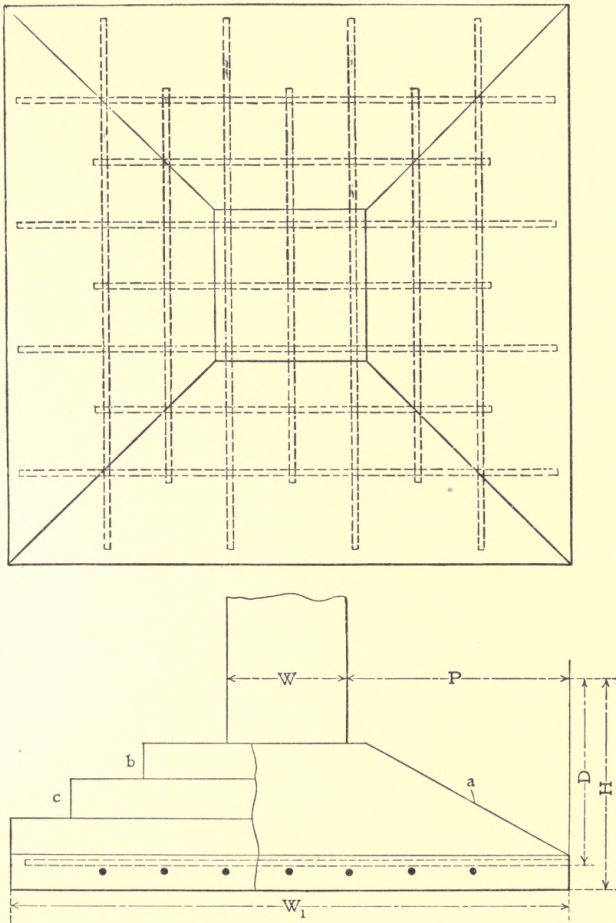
CALCULATING A REINFORCED CONCRETE FOOTING.
